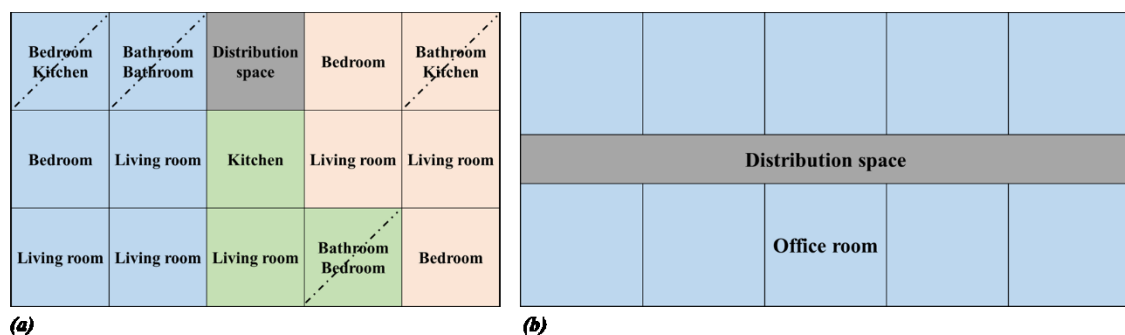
Concept of the typical floor plan of the residential building (a), with differently coloured flats, and of the office building (b).
